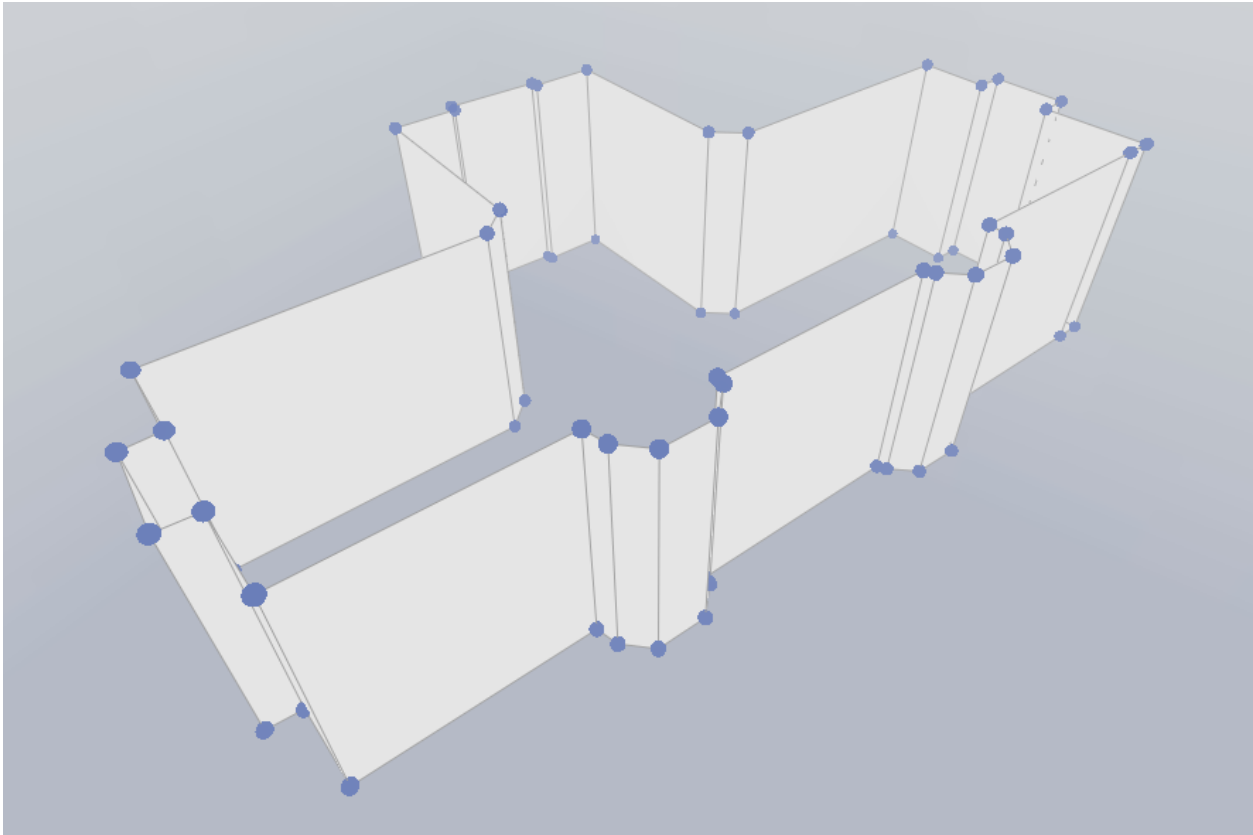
The wall tool makes constructing straight walls as easy as tracing a floorplan.
